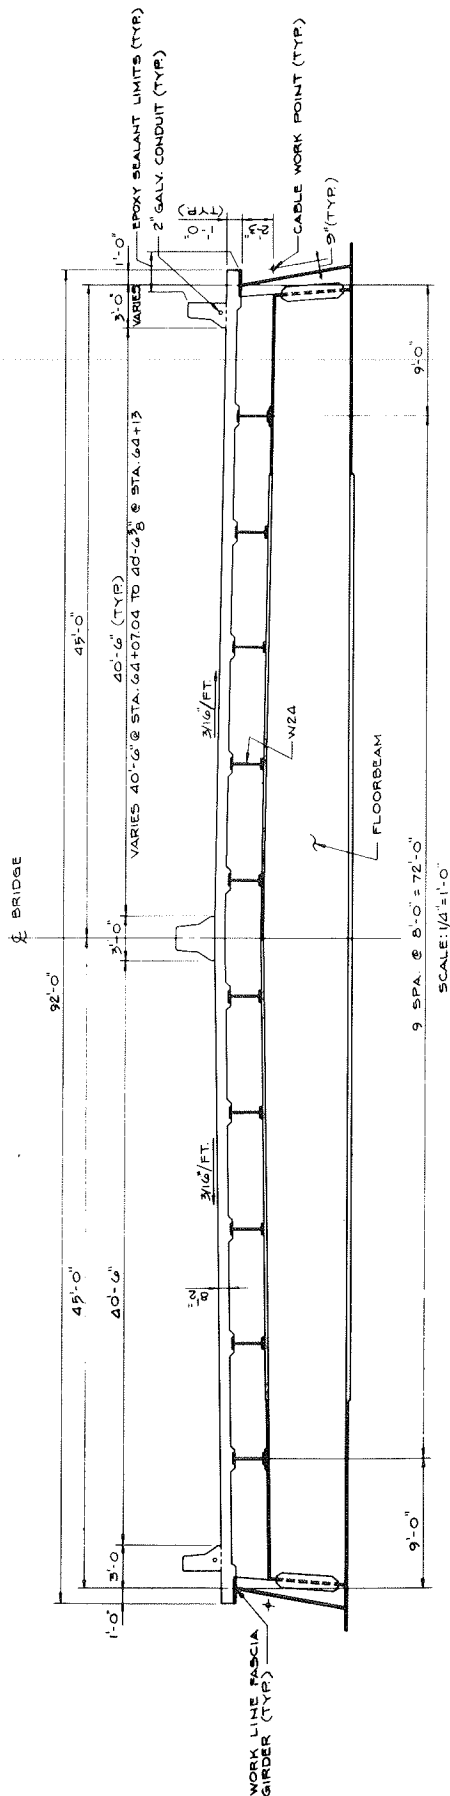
Cross section of cable-stayed bridge at floor beams FB1 and FB8.
